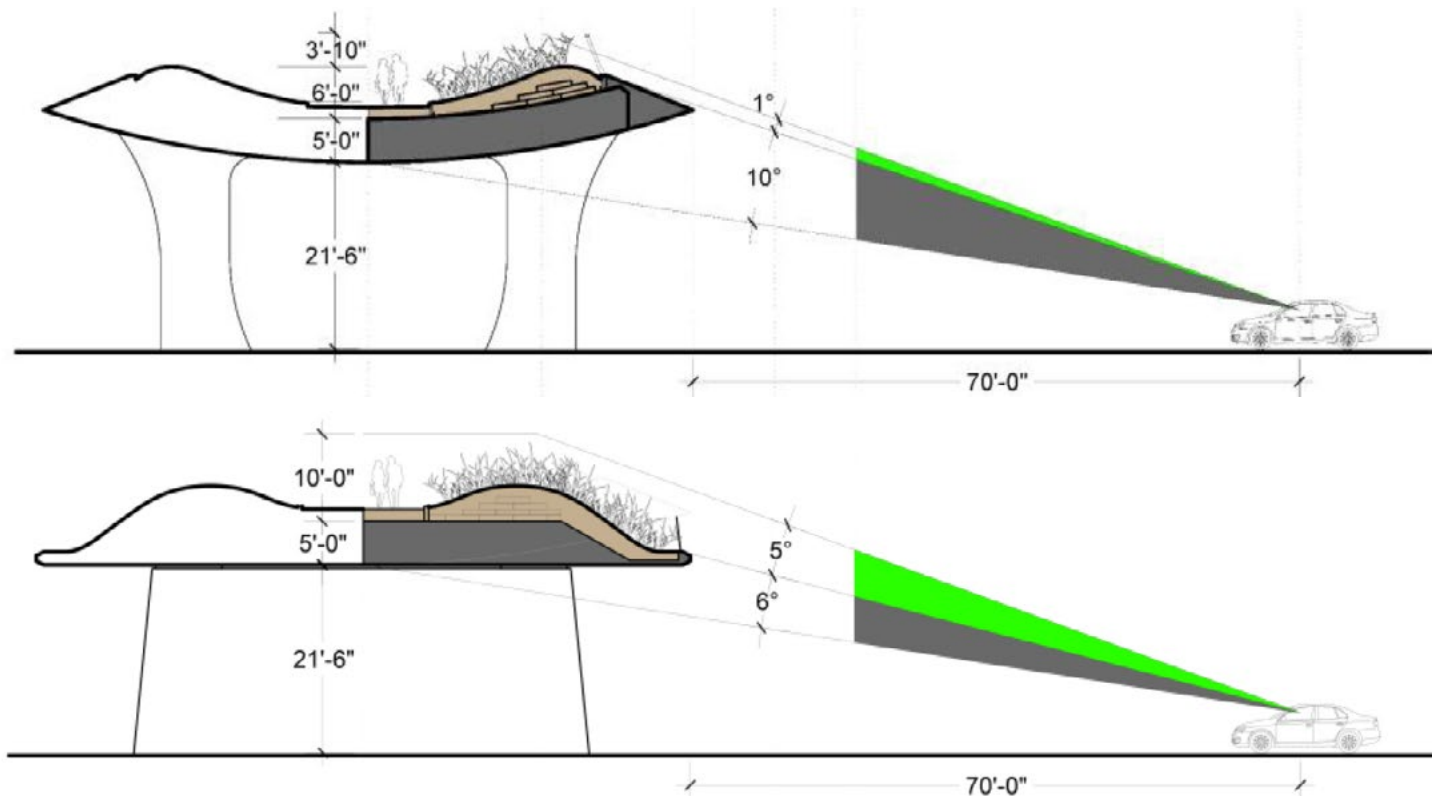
Previous landbridge design (top) and updated landbridge design (bottom)
